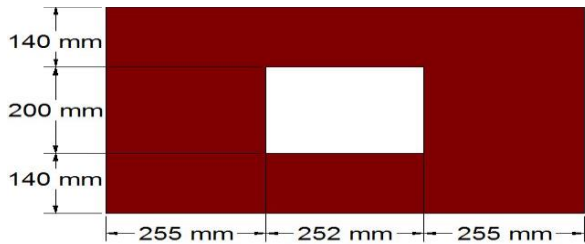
(c) Masonry wall with opening at the center of size 252×200
